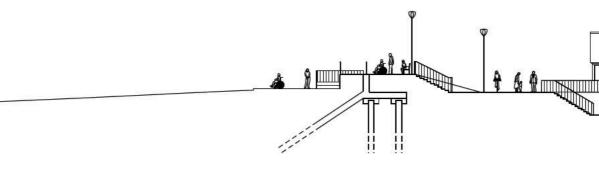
Option B - indicative plan of proposed new sea wall at Brooklands
